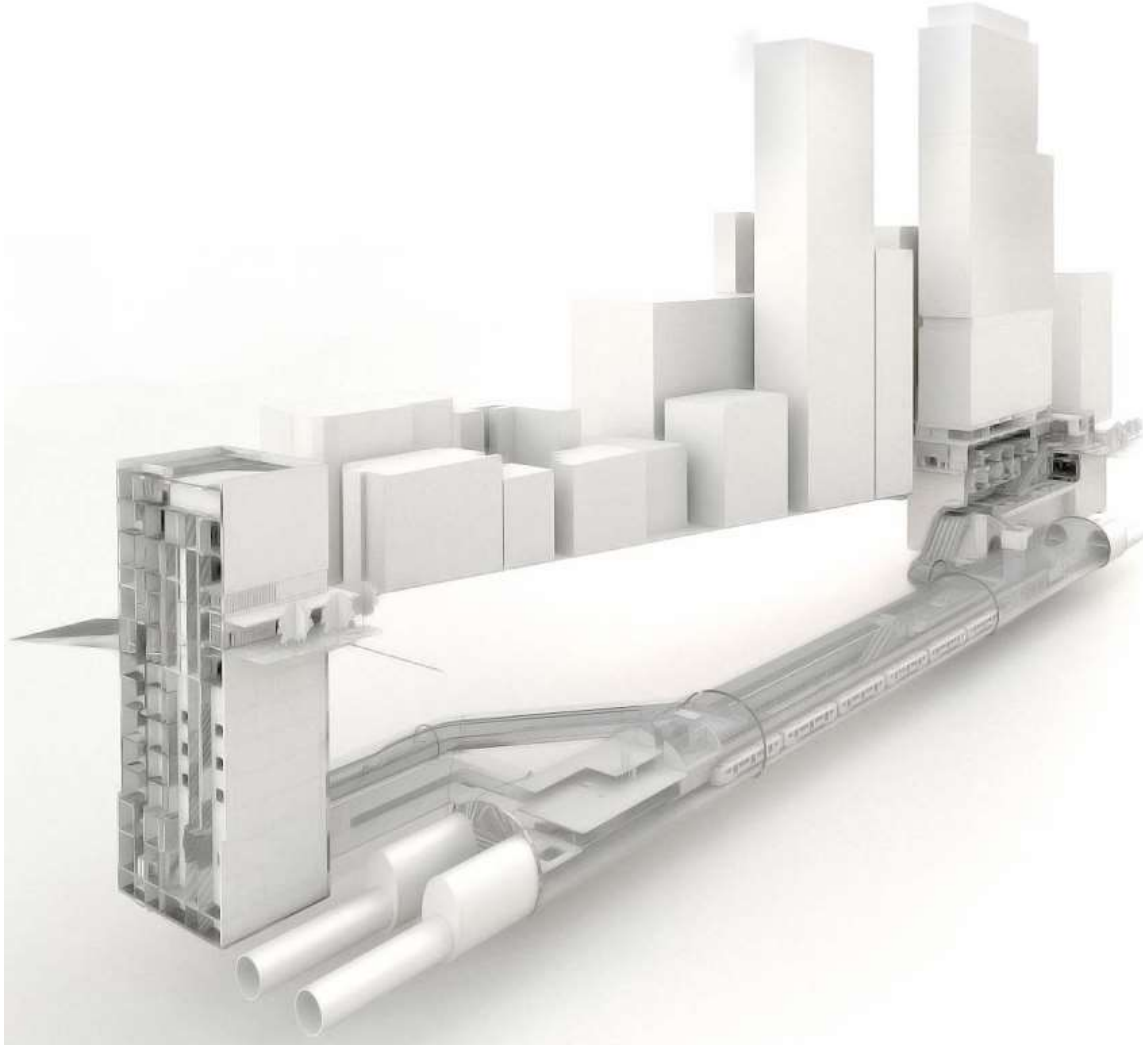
Victoria Cross Tunnel and Station structure perspectives describing an integrated design from foundation level to rooftop including a view of the new tunnels adjacent the shaft and the foundation soffits
